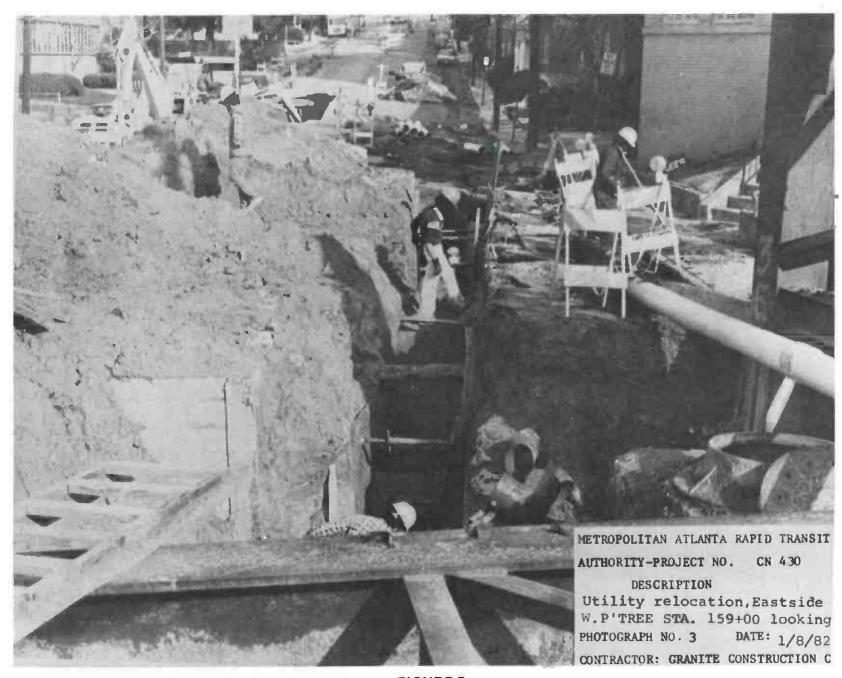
SPACE BETWEEN SOLDIER PILES AND EXISTING BUILDING IS USED FOR REARRANGEMENT OF UTILITIES
